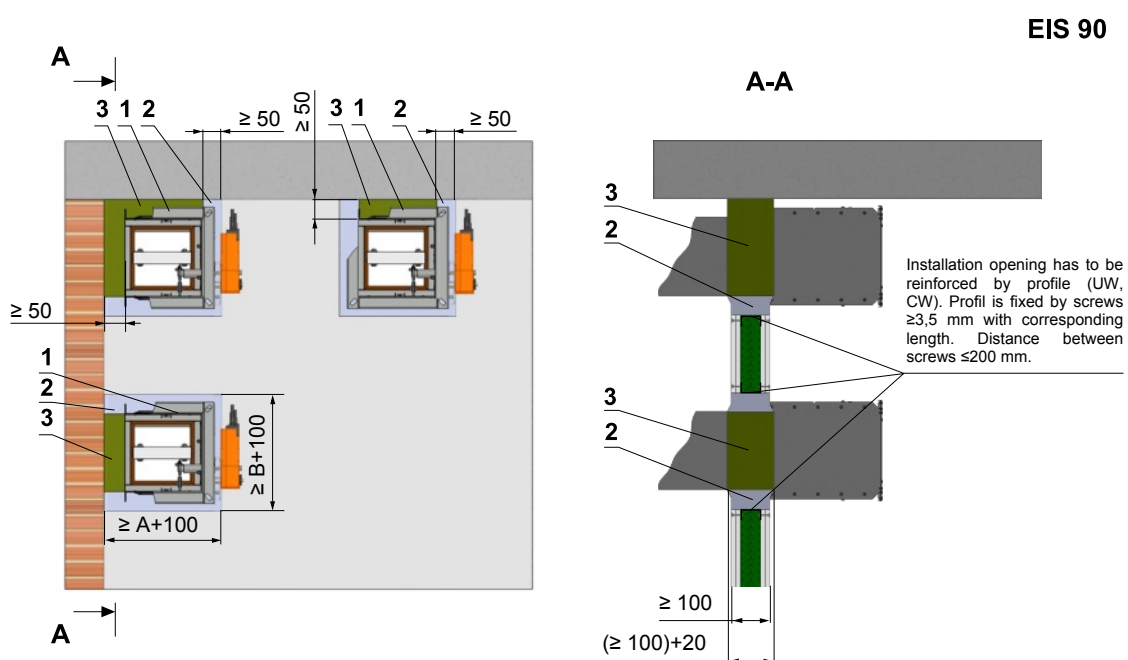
Gypsum wall construction - installation next to wall, ceiling - mortar or gypsum and mineral wool
